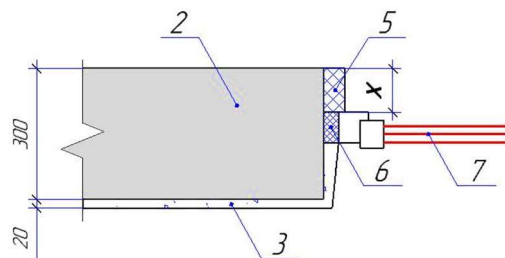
The junction of a metal-plastic window to a precast concrete wall with external jamb insulation
